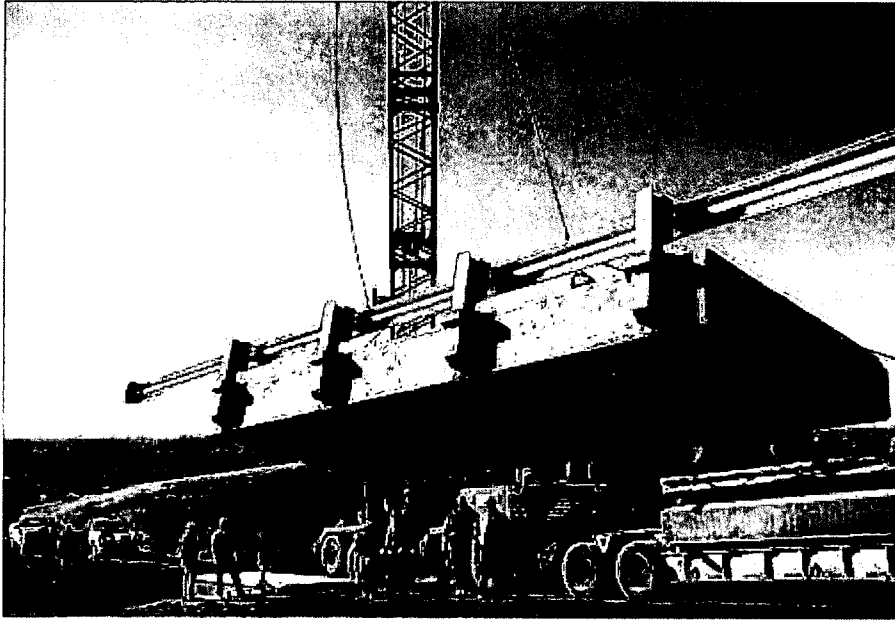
Pre-Fabricated Fiber-Reinforced Polymer Concrete Panel
